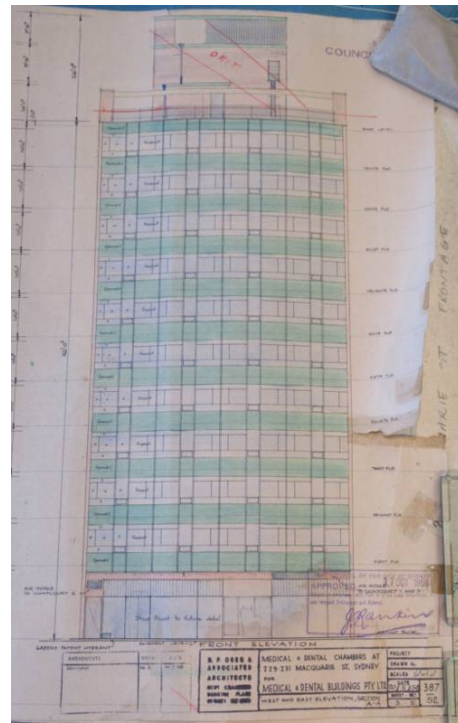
Macquarie Street elevation Showing the glazed façade layout
